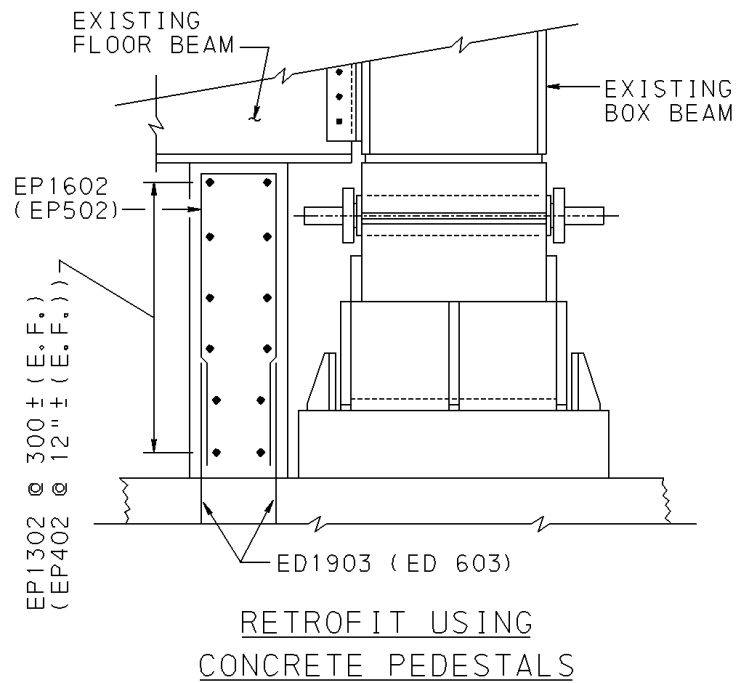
Retrofit Using Concrete Pedestals
